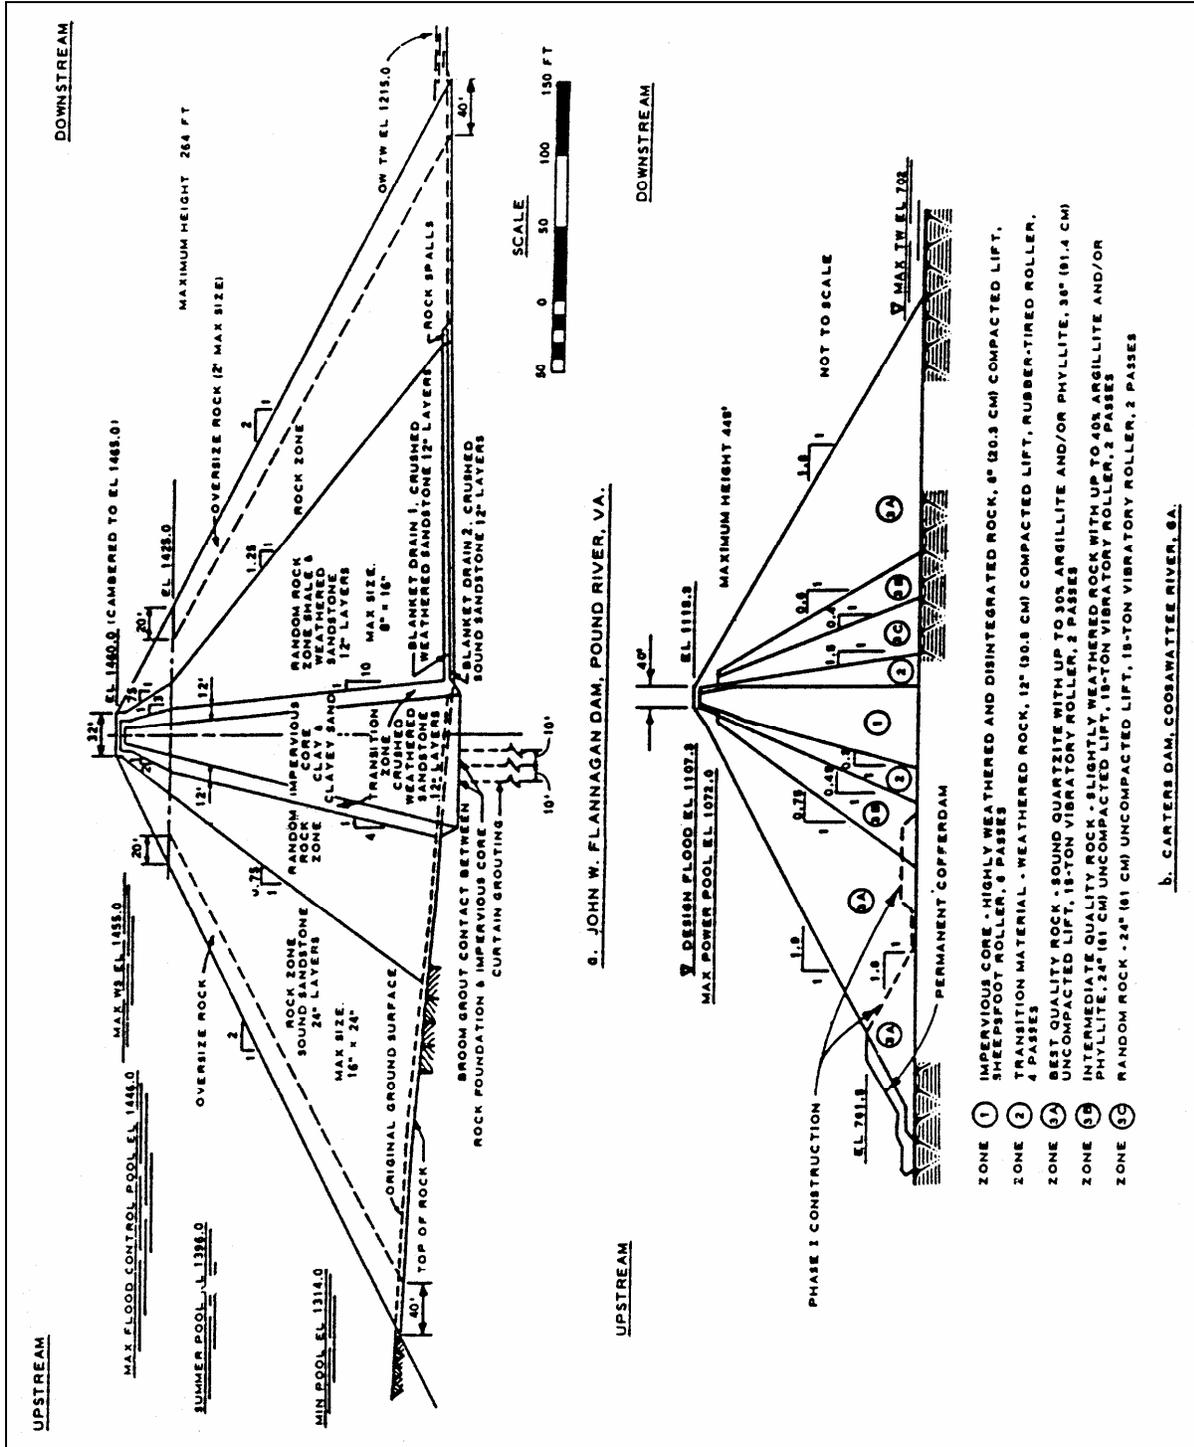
Embankment sections, rock-fill dams (John W. Flannagan and Carters Dams)
